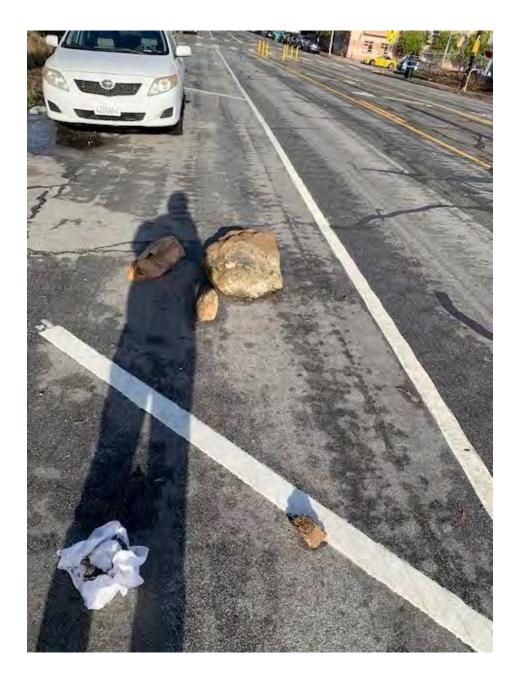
INNES AND DONAHUE – WEST RETURN
